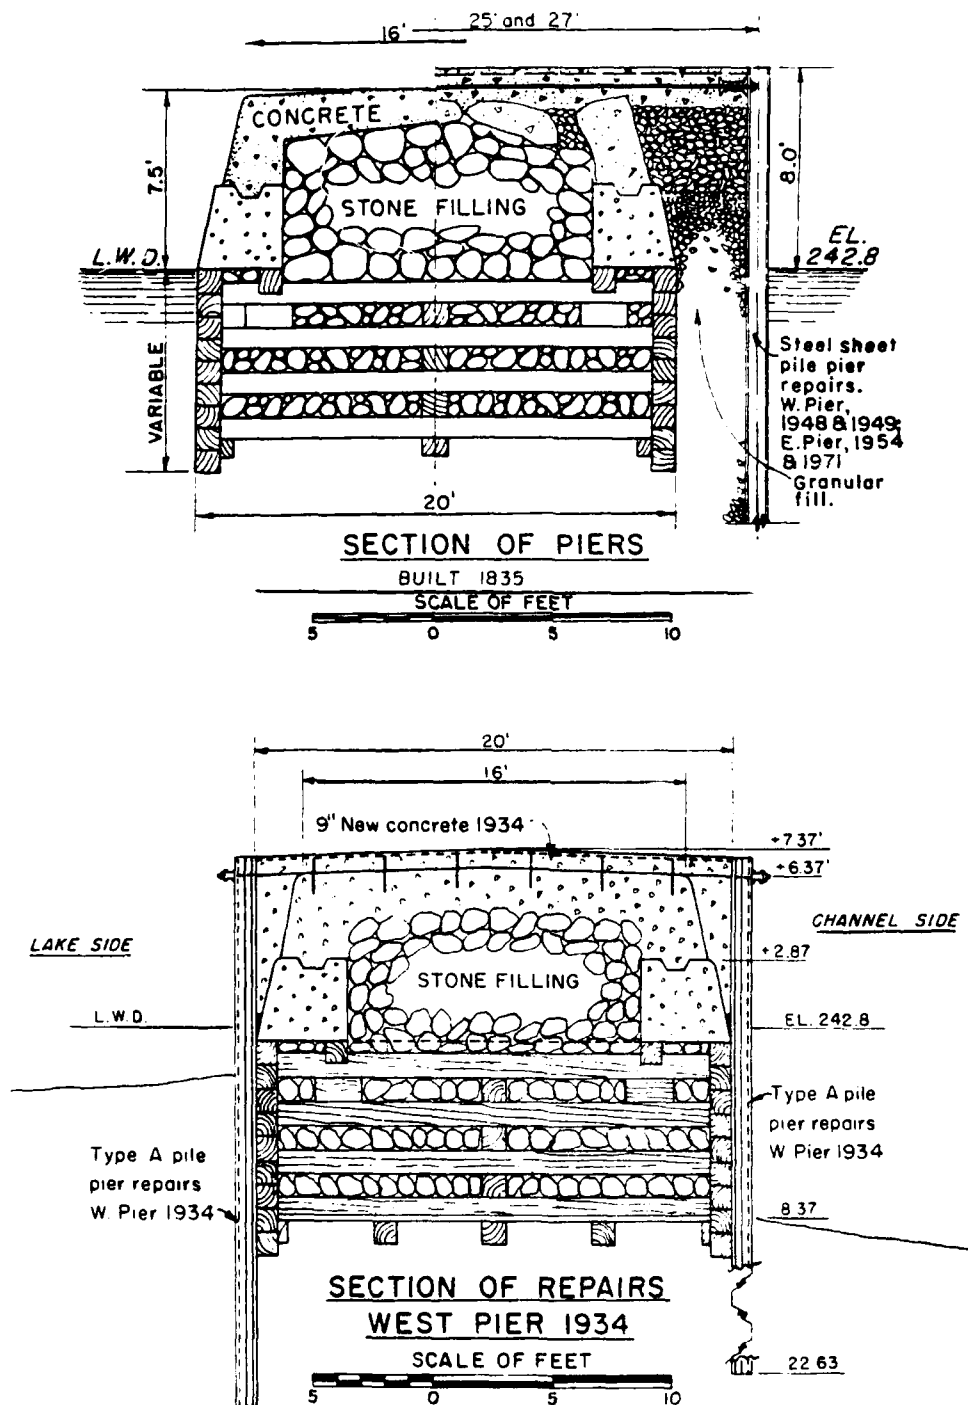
Typical pier cross sections, Rochester Harbor, New York
